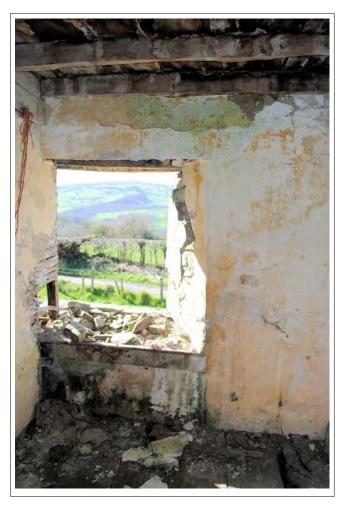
The southern wall of Room 5 (front of farmhouse), showing the window divided with Room 3.
